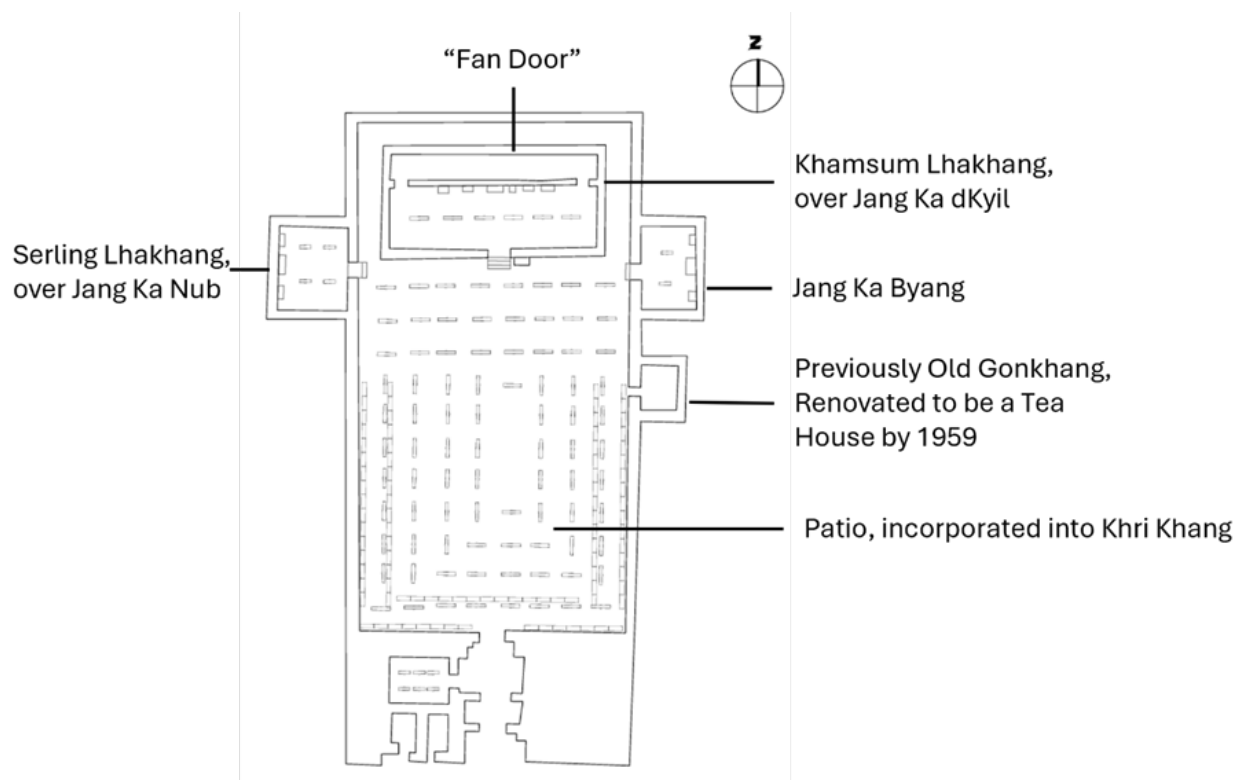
Floor plan of Parkhang Chenmo redrawn from (Su 1996) and labeled by Authors.
